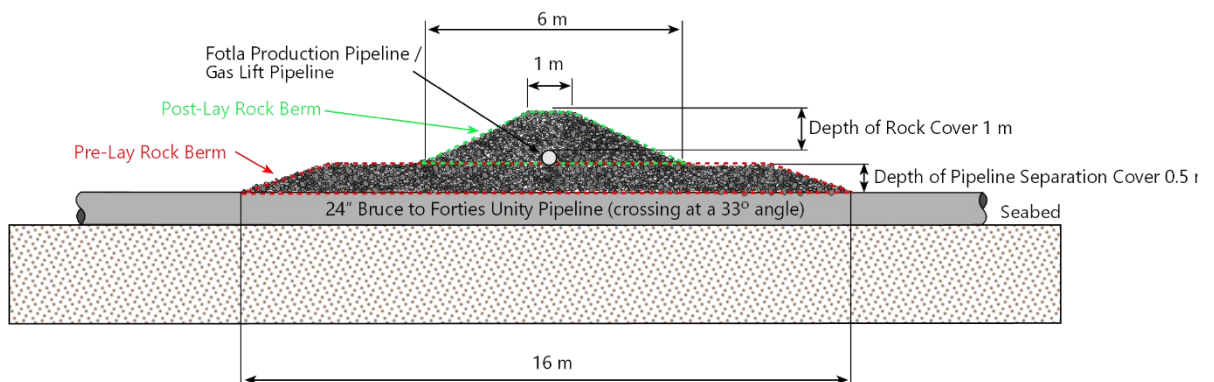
Cross section of the rock placement profile at pipeline crossing
